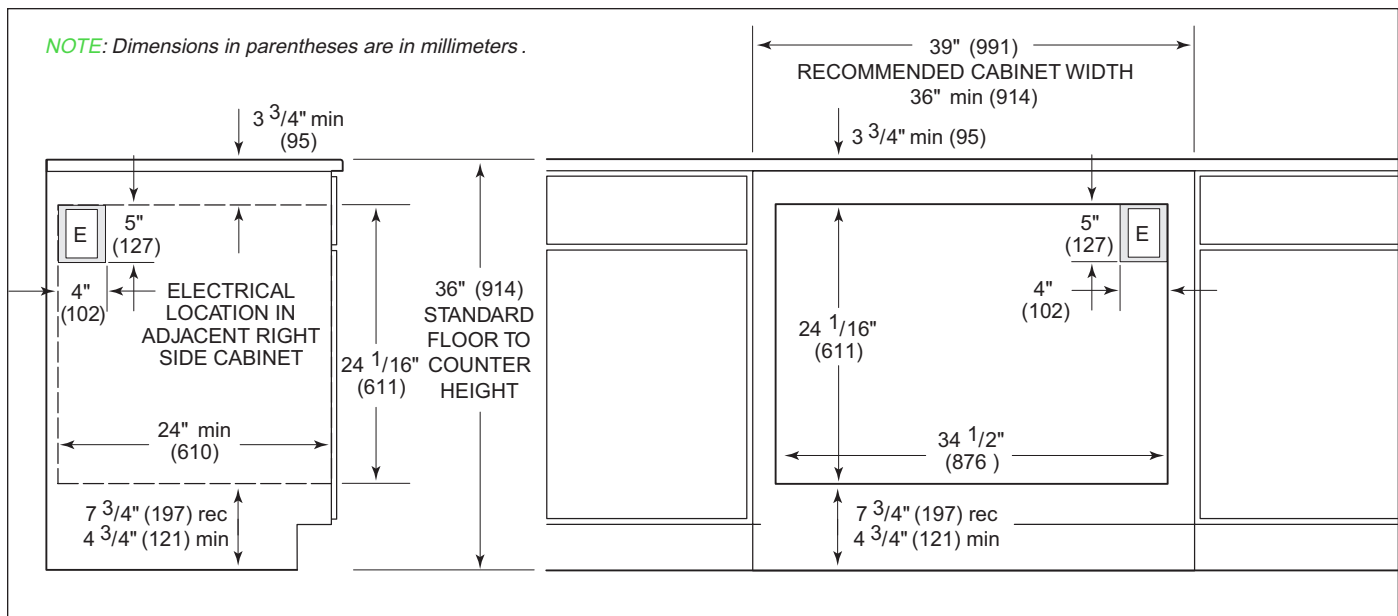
Undercounter Cutout Dimensions and Electrical Placement
